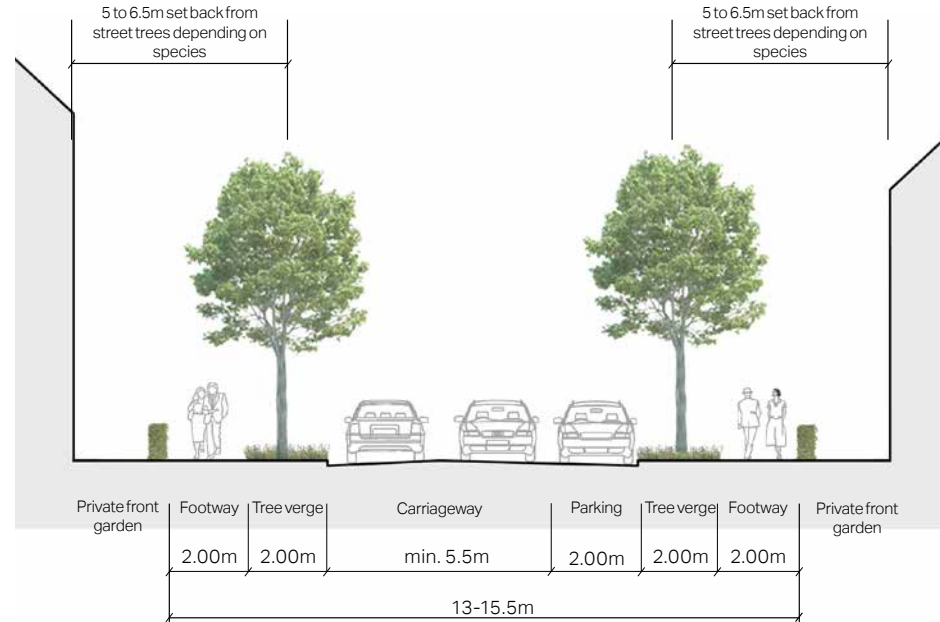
Cross-section to illustrate some dimensions for primary streets.
